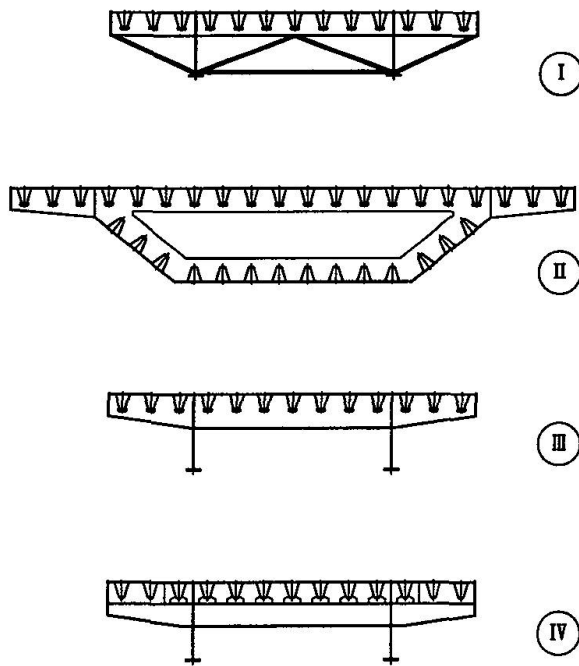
shows four load carrying systems. For simplicity only systems with continuous closed stiffeners are shown. Type I is a plate girder bridge with crossbeams that consists of a truss and a top cord acting as a continuous beam with short spans. The continuous beam transfers the loads by bending and shear to the truss nodes. The truss is supported by the main girders. Type II is a box girder bridge. The diaphragm of the box acts as a deep crossbeam that transfers the loads to the inclined and vertical webs of the box girder. Type III is a conventional crossbeam with cantilevers that are supported by the main girders. Type IV is an I-shaped crossbeam that receives the loads from the supports of the closed stiffeners. The shear connections in the cantilever sections cause a rotational spring using the axial stiffnesses of the deck plate and the I-beam and a lever arm. This is called the "Floating Deck Structure" and is used in a few bridges in the Netherlands [1]. It has been developed for its easy of assembly.
